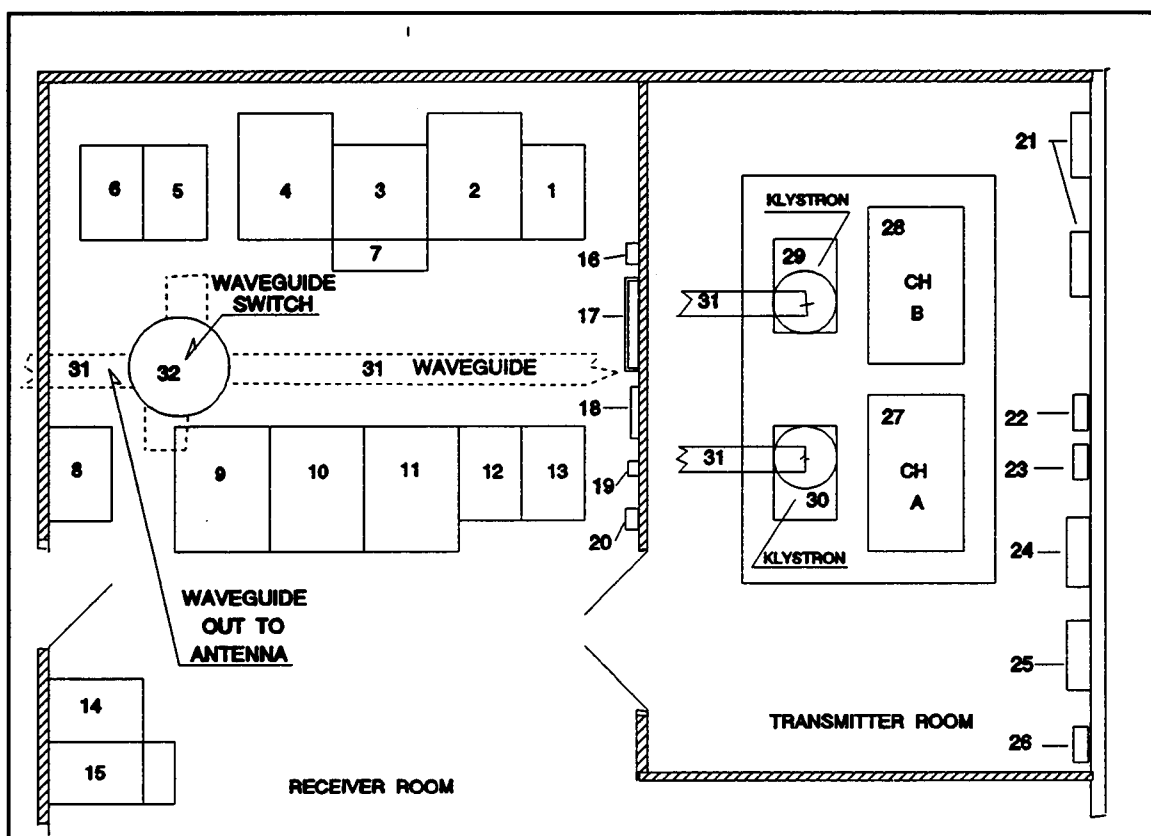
ARSR-3 TYPICAL SITE LAYOUT
